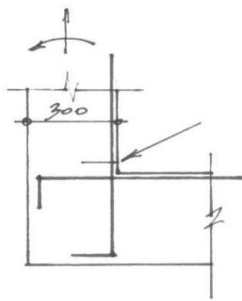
Wall section, 300 mm thick, eccentrically loaded
